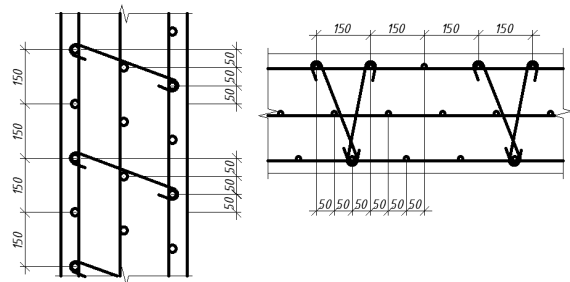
Recommended reinforcement of reinforced concrete structures according to DBN B.2.2-5:2023
